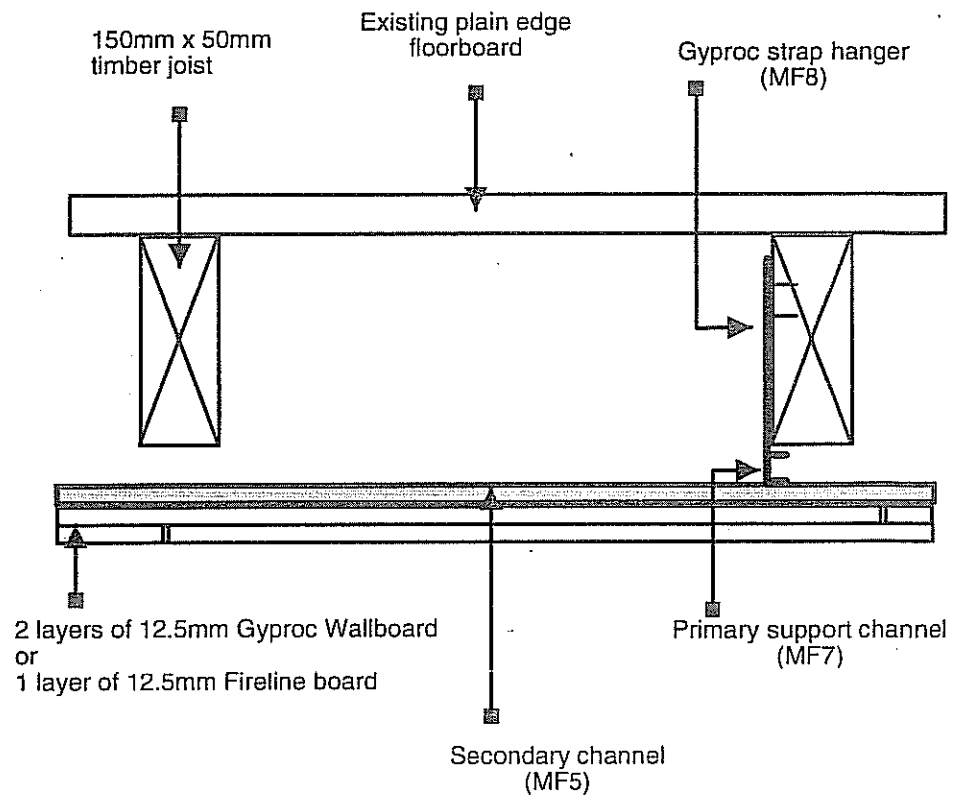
Use of Gyproc Wallboard or Fireline board to provide a suspended ceiling of 30 minutes fire resistance
